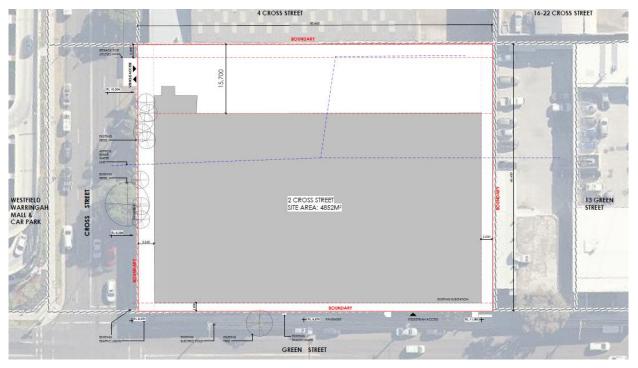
Extract of site plan for existing development (Source: Pace Architects)
